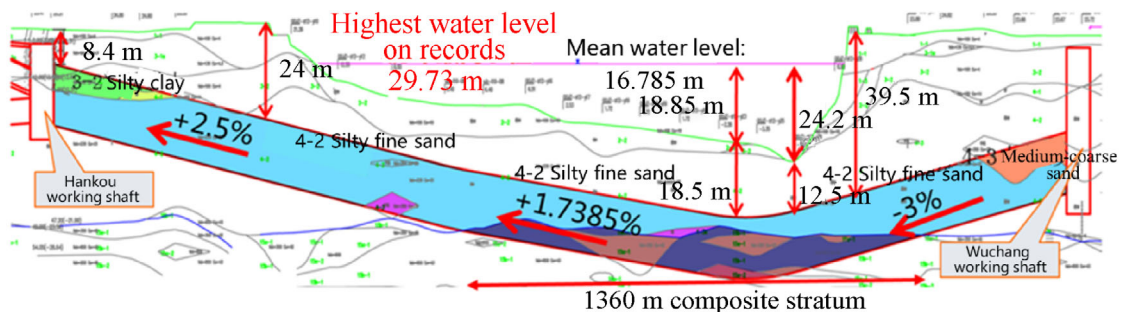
Vertical geological section of Sanyang Road Cross-river Tunnel
